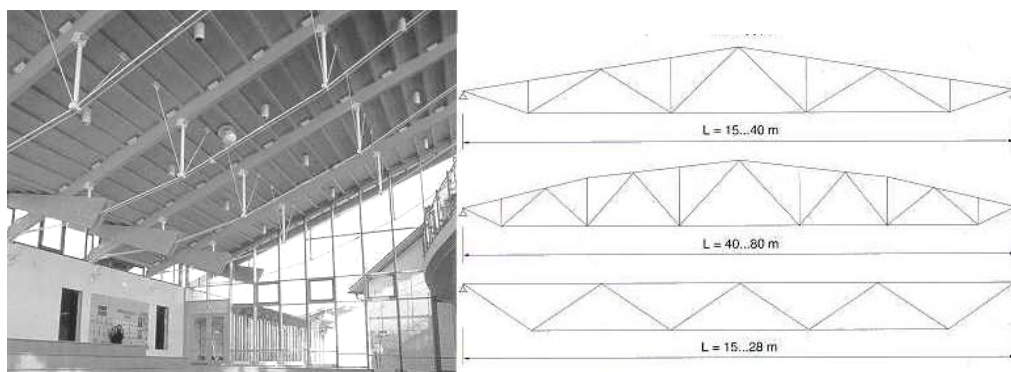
The use of LVL in roof structures as beams and trusses
